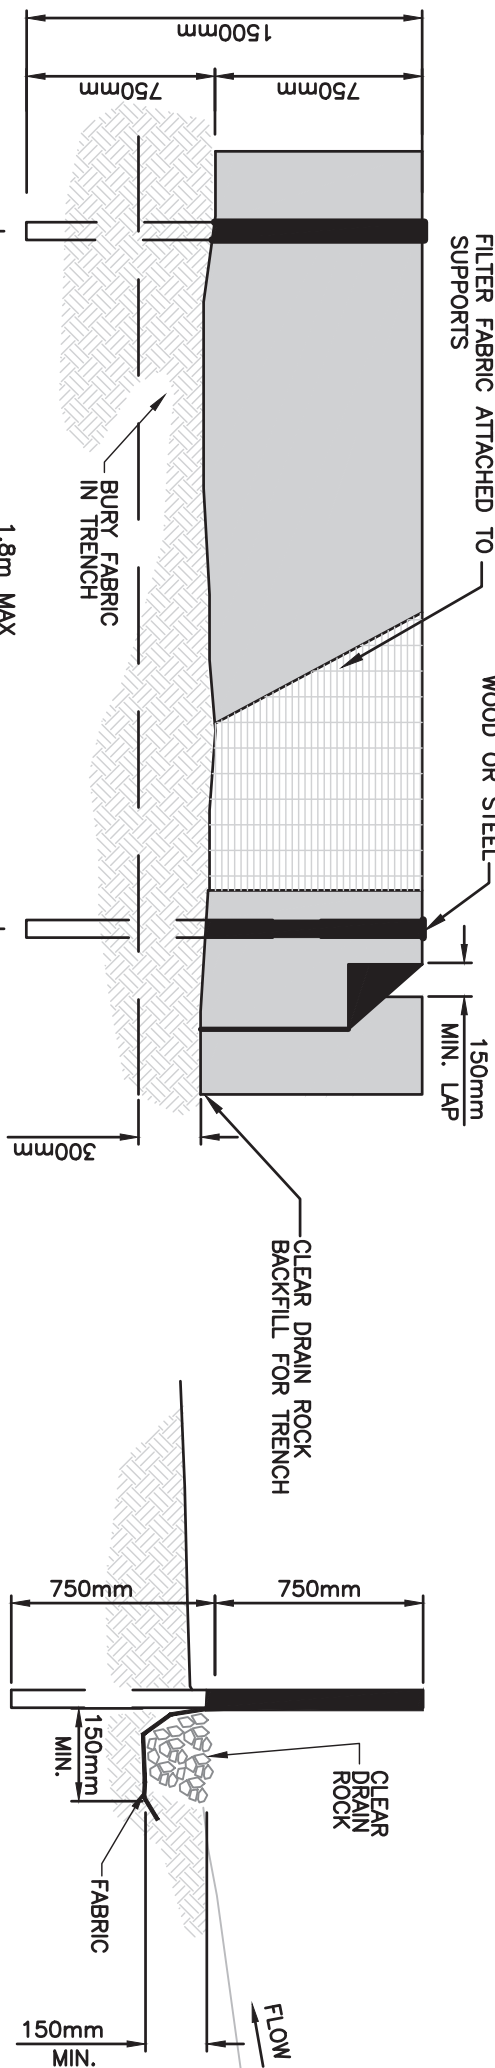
TYPICAL CONSTRUCTION SEDIMENT CONTROL SWALE SECTION
